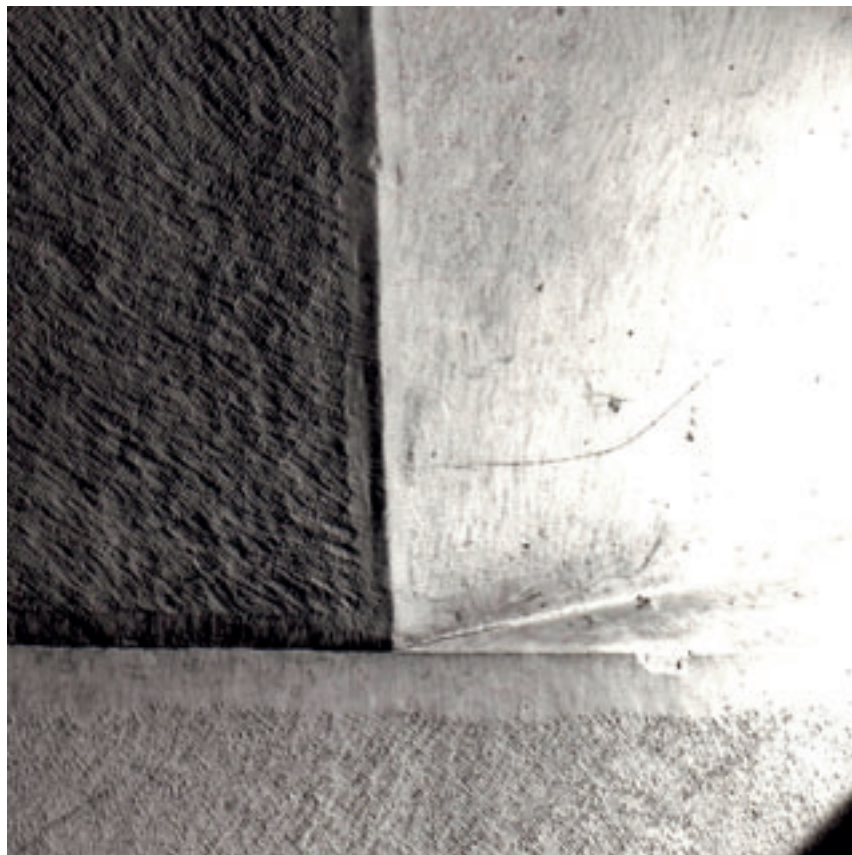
Trajan's Column, inside staircase, detail: finished surface of the splayed window openings
